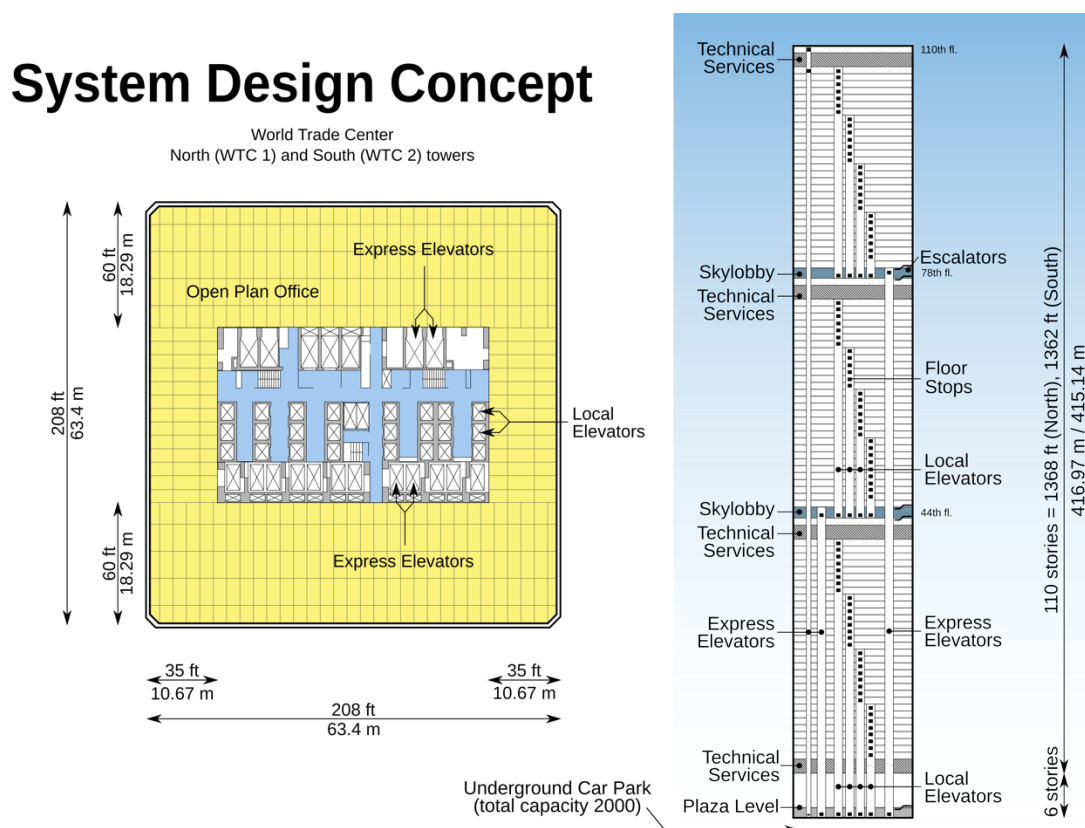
System design concept of the original North and South Towers: 63.4 m (208 ft) square plan with column-free office space surrounding the central core (left), and three-zone express/local elevator arrangement with sky lobbies at floors 44 and 78 (right). Source: Wikimedia Commons/Messer Woland
